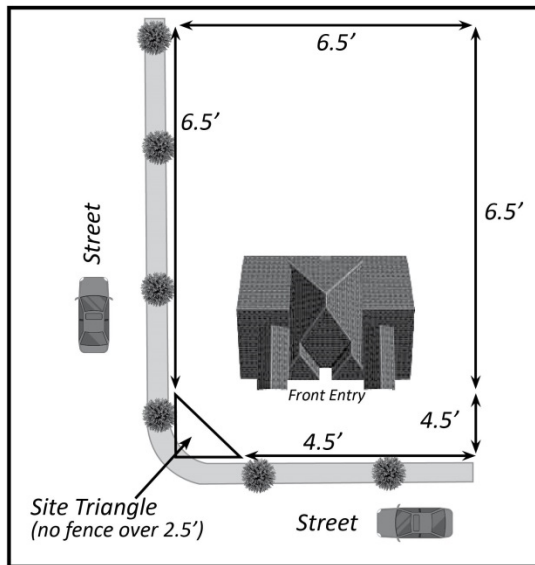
Fence location on corner residential lot (principal building facing shorter side)
